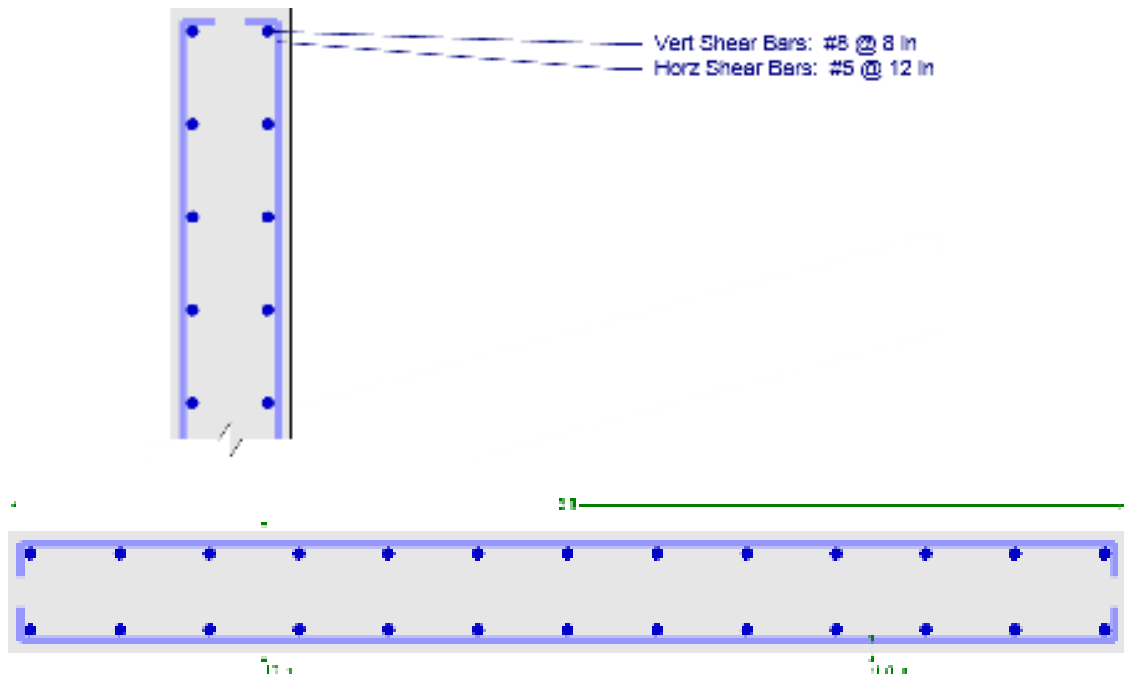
Building (B4-6S-L-O) Ordinary RC Shear Reinforcement Details; Wall Section for Floors 1-3
